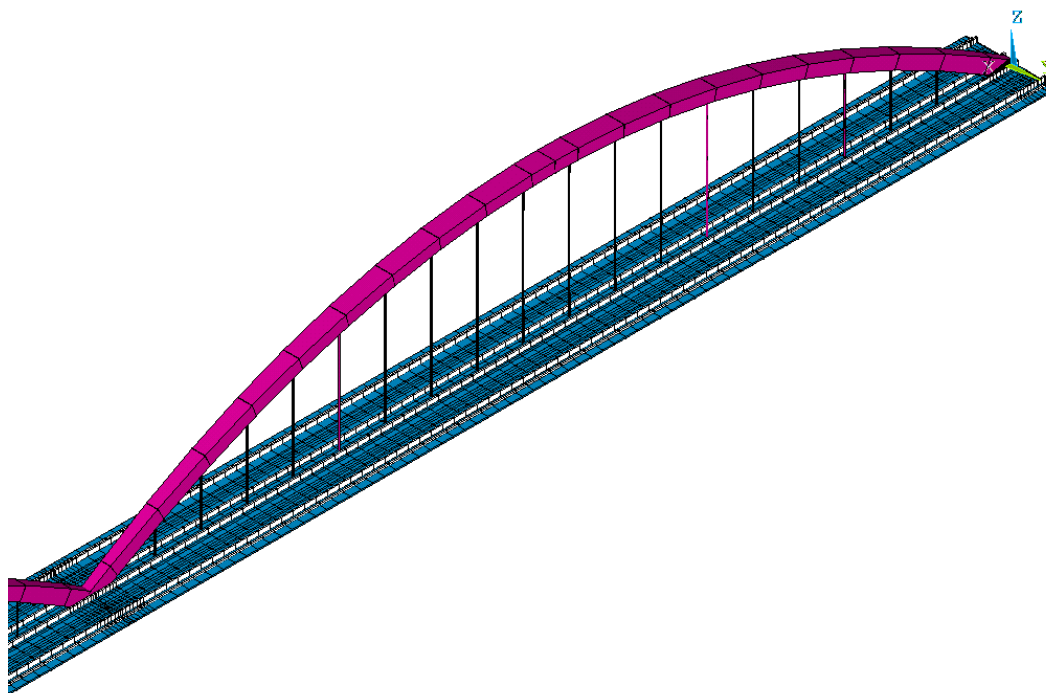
Numerical model of the bridge of the new railway crossing of river Sado (1st span).
